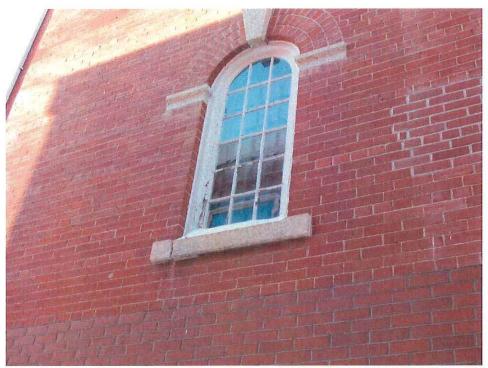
South face of Chapel showing severely cracked Tyndall Stone sill
